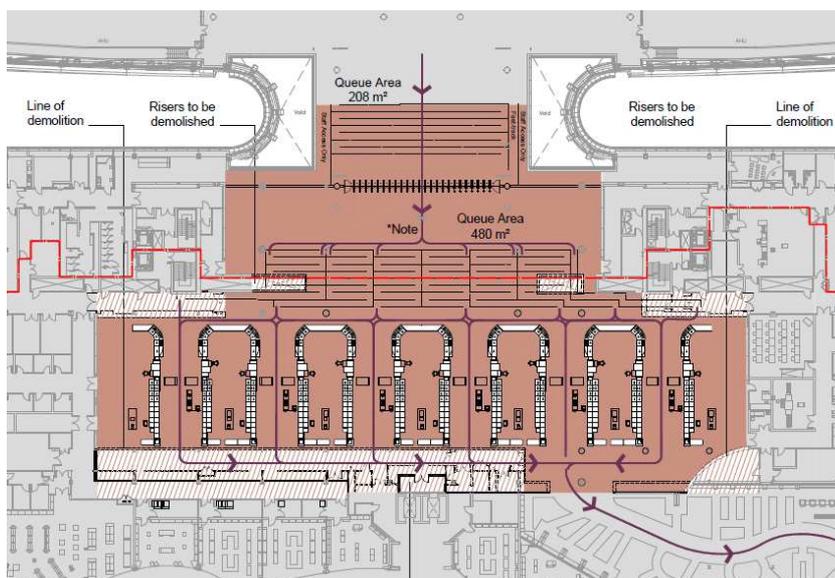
Plan view of new proposed CSA at Terminal 2.
